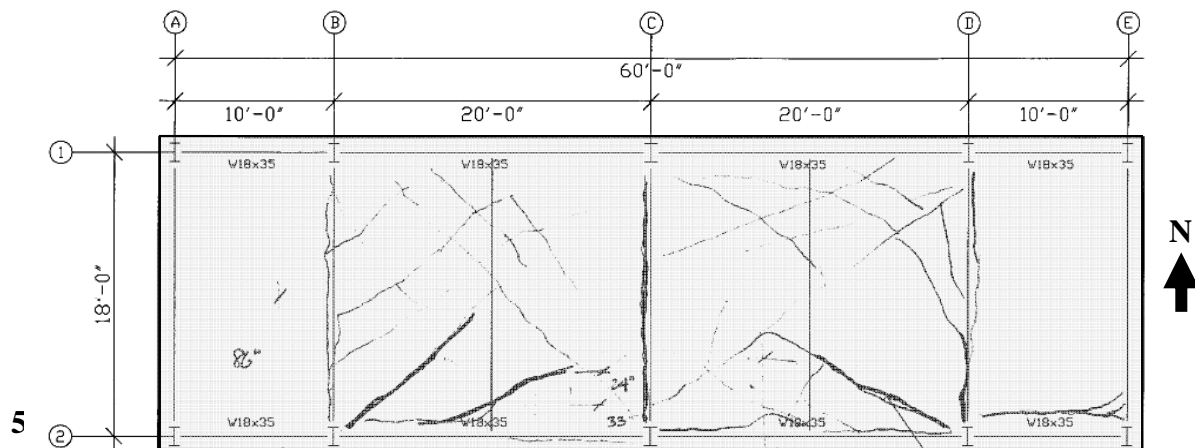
Crack Patterns on the Top Surface of the Concrete Slab after Test NSF-1 (Tan and Astanah-Asl, 2003).
